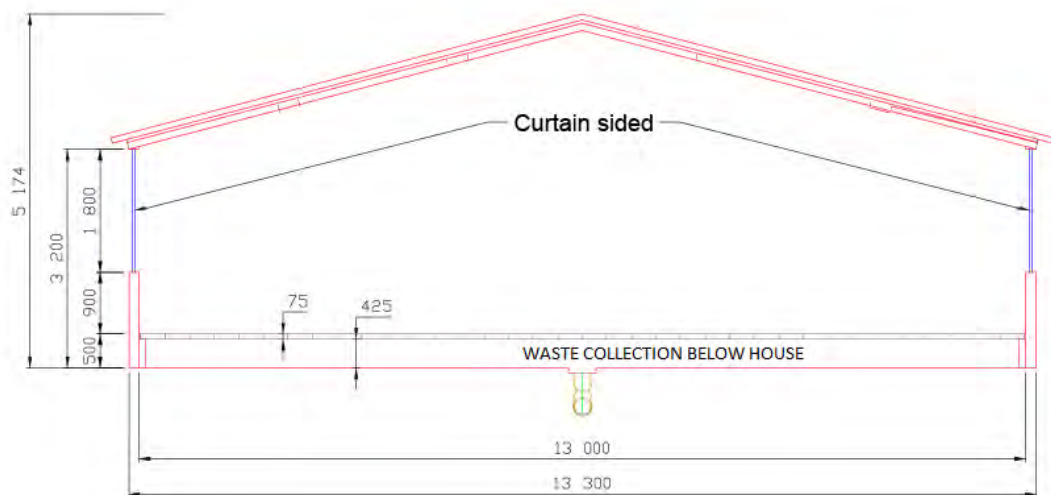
Typical pig house where contaminated waste is collected below
